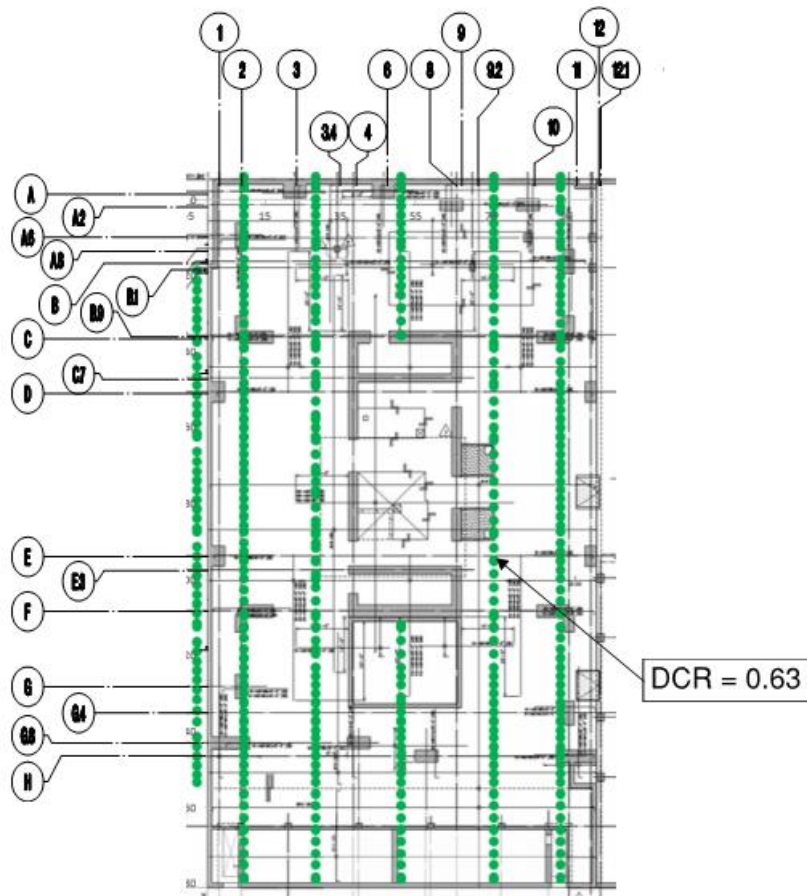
DCR Plot for North - South Top Reinforcement Design Strips for Gravity Load Envelope Existing Condition
